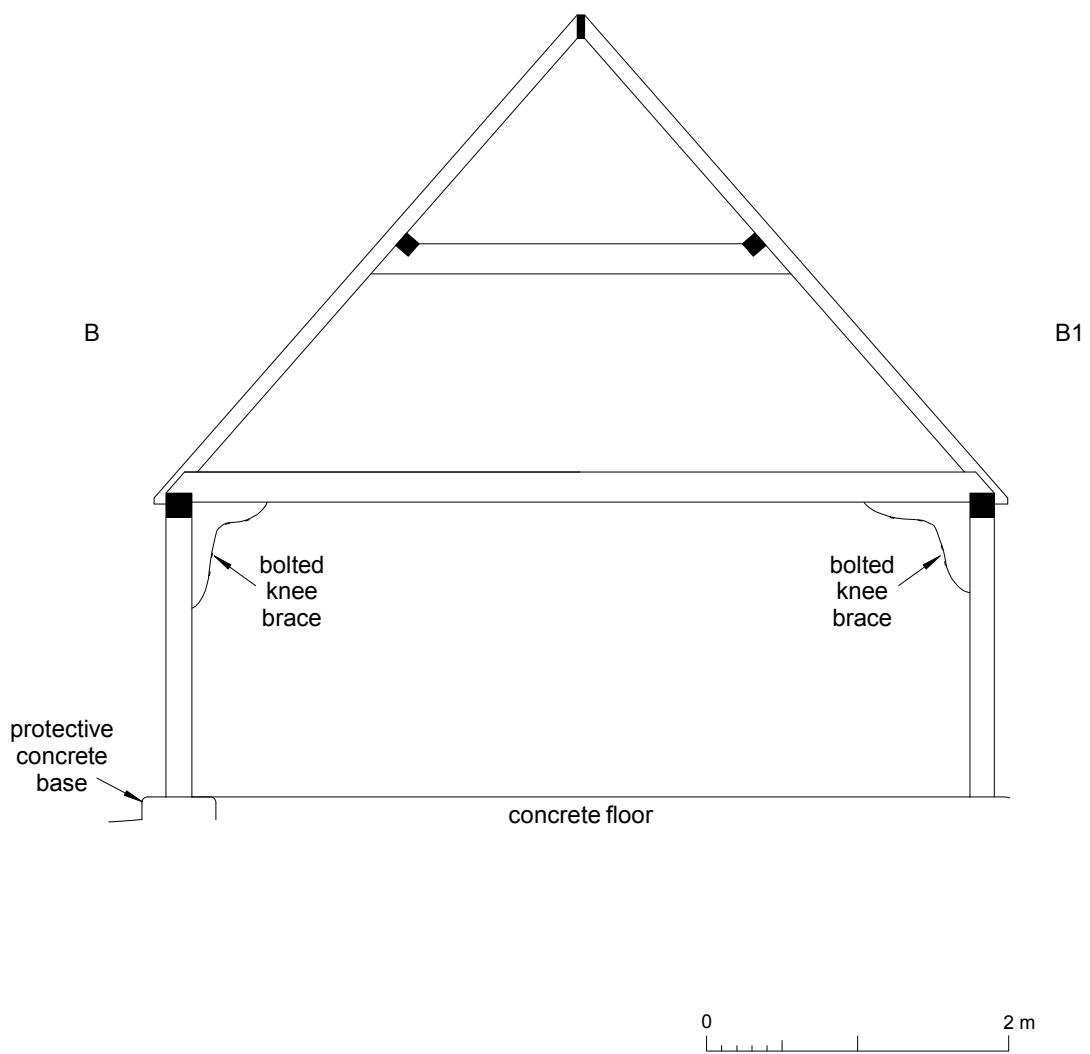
Barn 1, structure 1b: cross-section of truss B.
